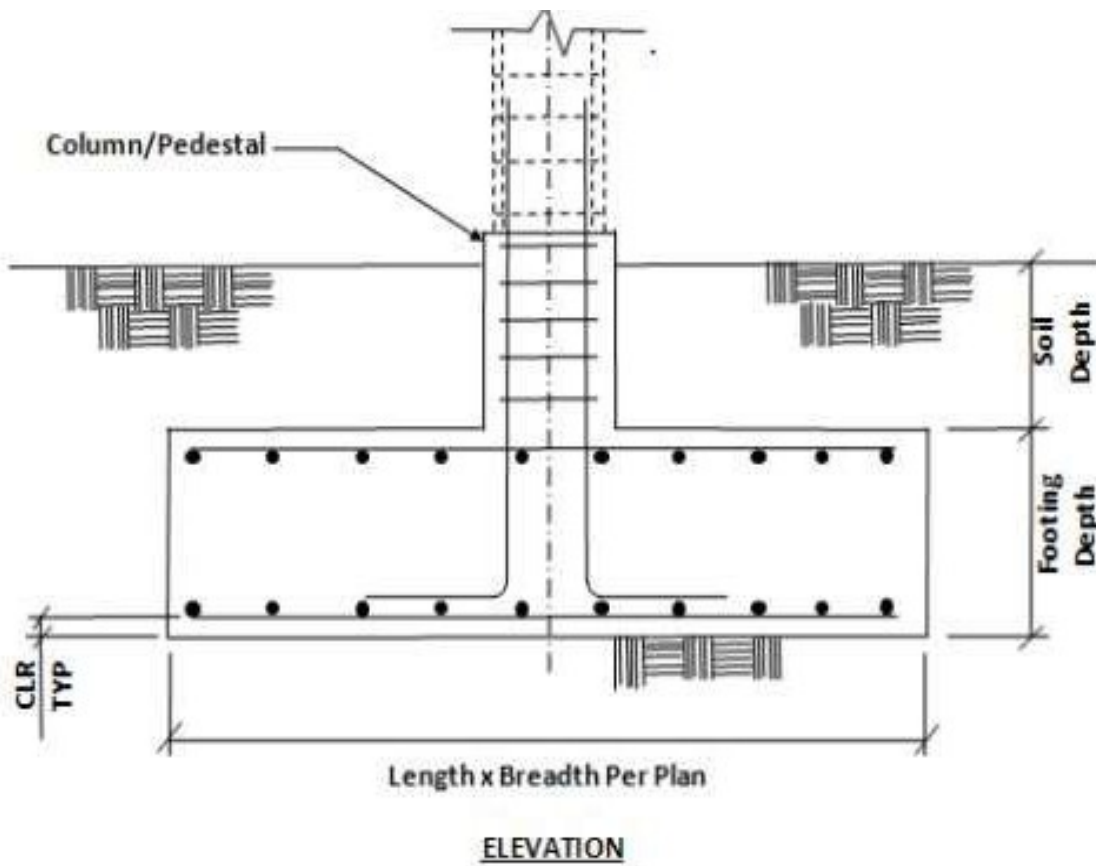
DESIGN OF AN ISOLATED FOOTING
